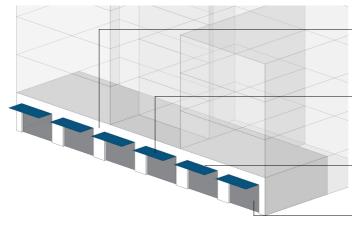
CCI 2: Retail Frontage Architectural Built Form and Character
